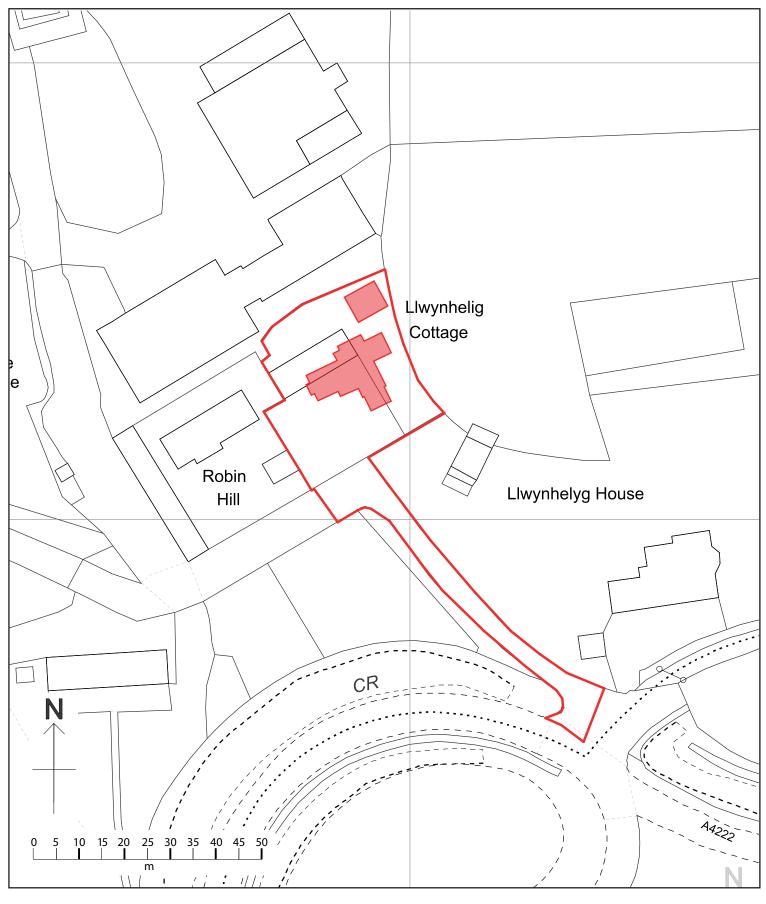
Plan of Llwynhelig Cottage with the footprint of the new build in red
